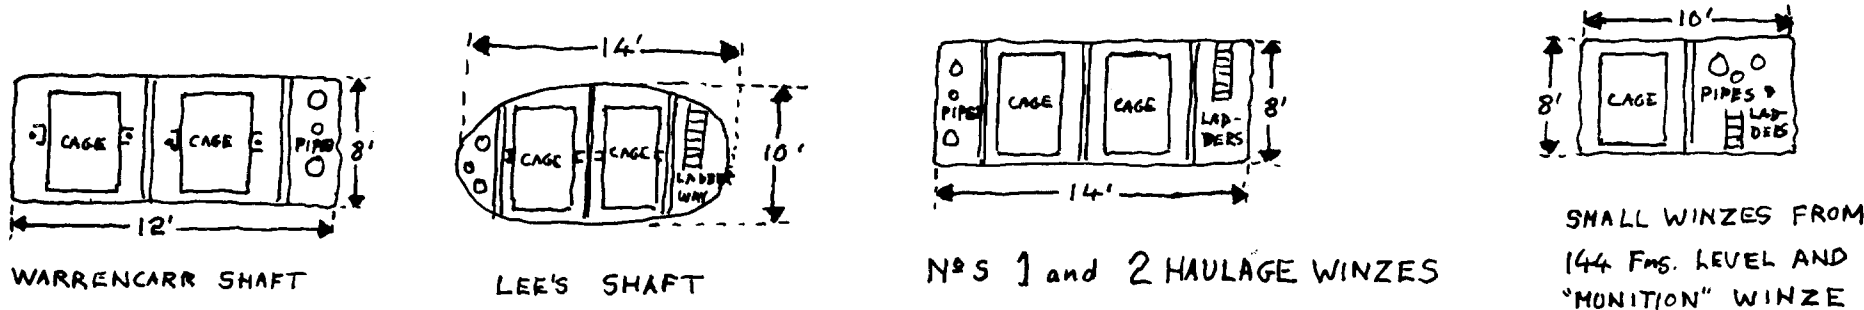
Sketches of shaft lay out at Milliclose Mine.
